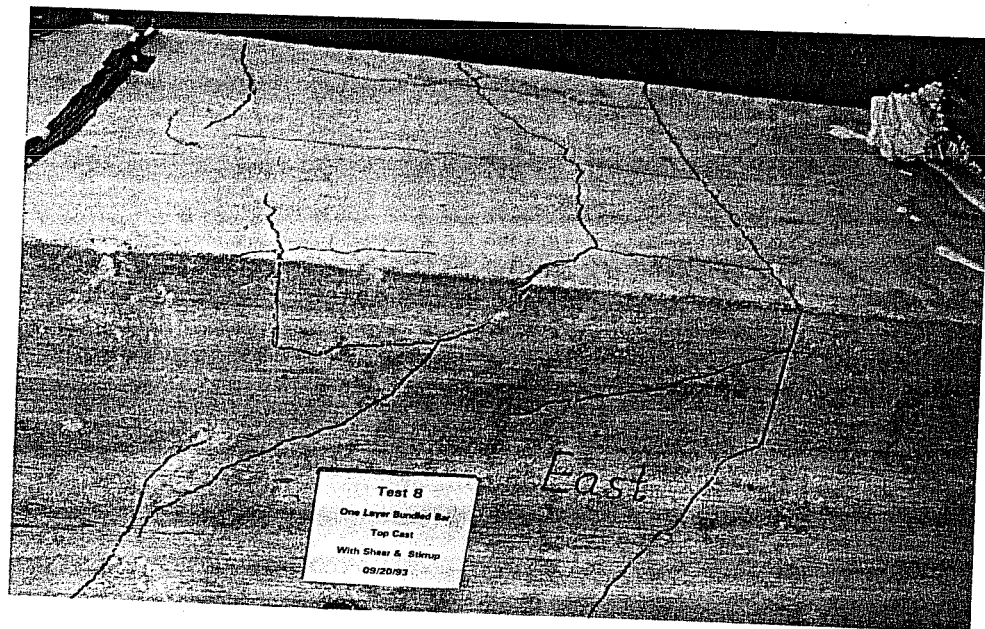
Failure mode of one layer of bundled bars with transverse reinforcement -- shear in anchorage zone (Test 8 1-16-S-T)
